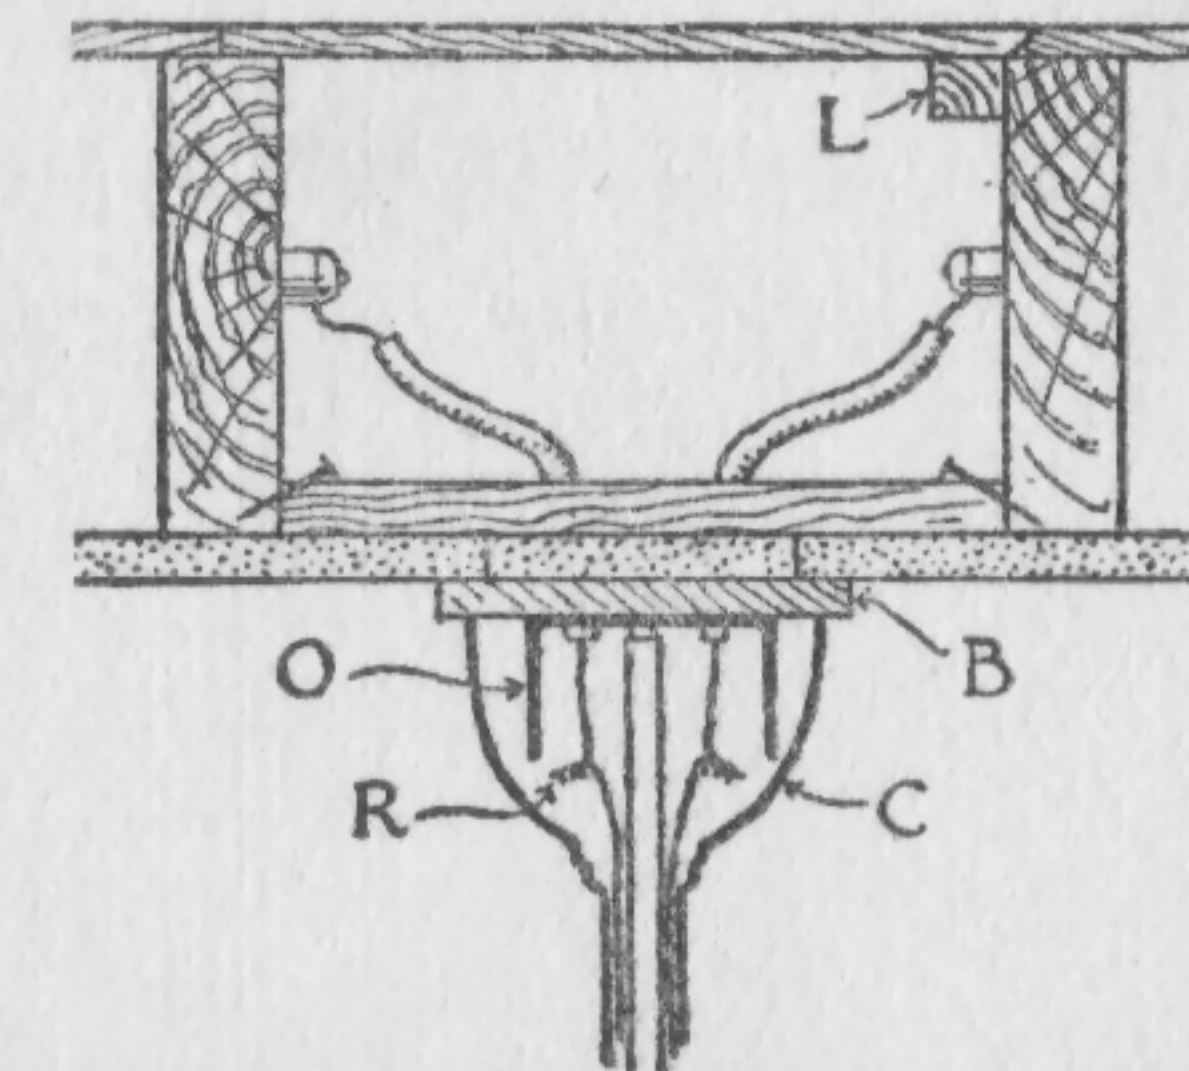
A section through floor and ceiling, showing the wiring for a ceiling fixture. In the flooring above, a pocket has been cut, and then the flooring has been replaced on the new ledge *L*, as explained in the text. A board has been nailed between the joists, just above the lath and plaster. Into this board the canopy block *B* is nailed or screwed, and to the block is fastened the iron outlet box *O*. (Often this box is fastened directly to the board between the joists and the canopy *C* rests directly against the plaster.) The circuit wires are usually joined to the fixture wires by rat-tail joints inside the canopy, as at *R*, the joints being covered with friction tape.
